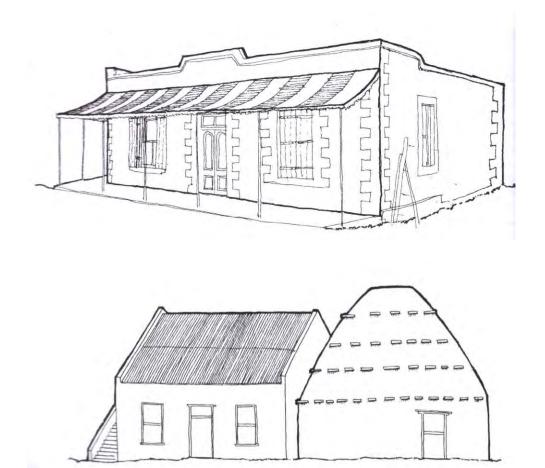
1880's Karoo dwelling with concave corrugated sheeting roof (above) with earlier corbelled house with pitched roofed addition (Frescura 2016:42).
